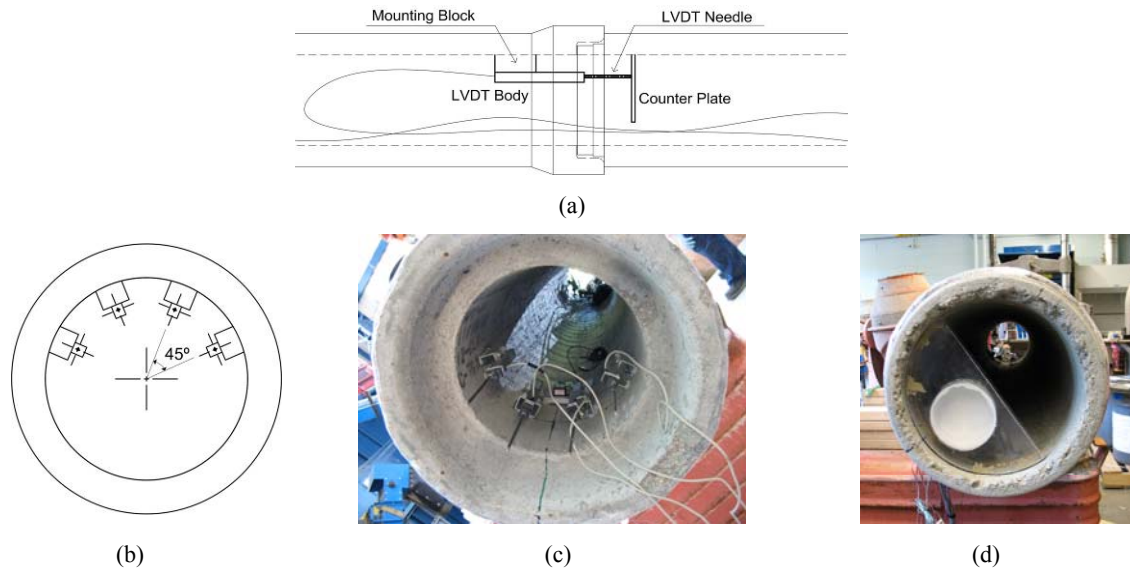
(a) Schematic of a LVDT installation at a typical joint; (b) A set of four LVDTs at upper part of pipe cross section; (c) Four LVDTs mounted on C-channel blocks on the interior of the pipe near the bell; (d) A dichotomy-shaped Lucite plate mounted in the spigot.
